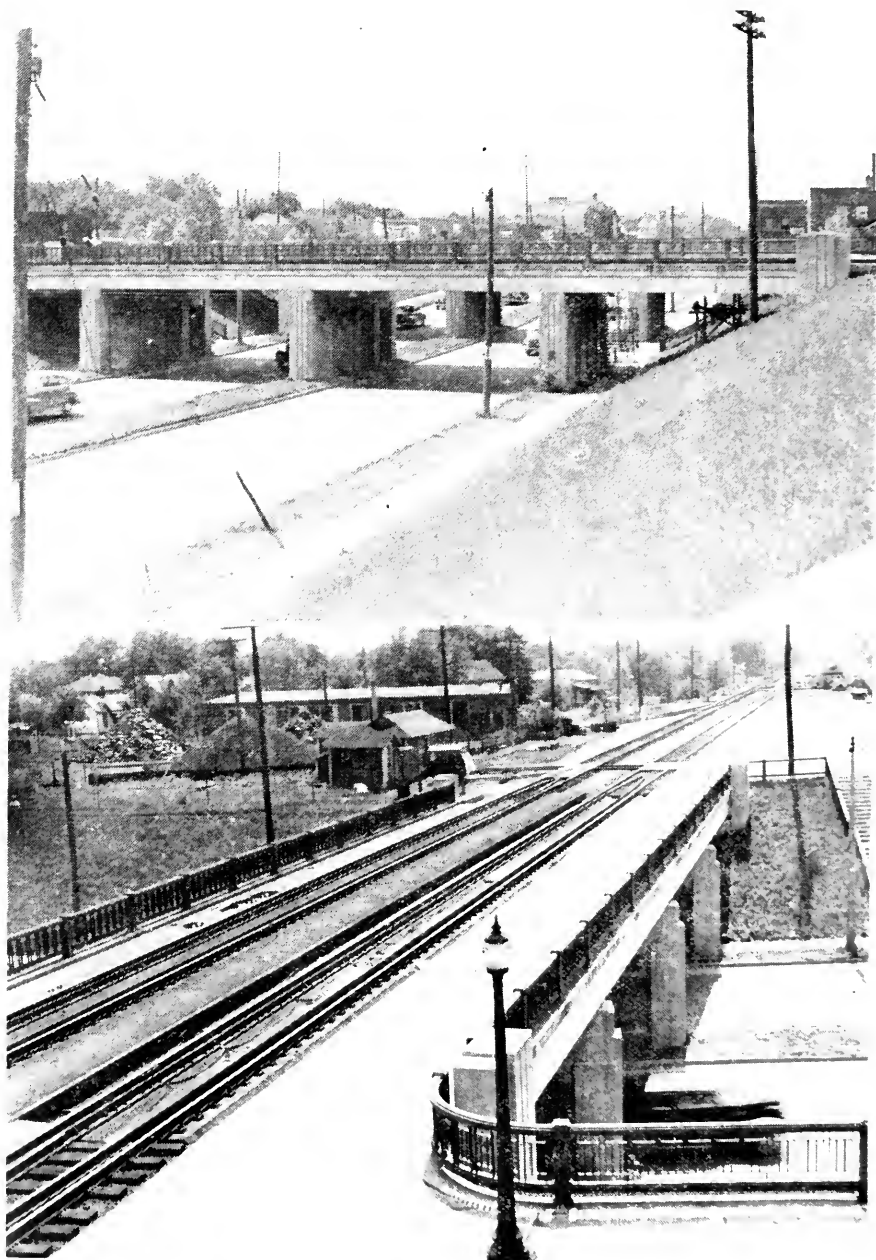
General views of reinforced concrete continuous span viaduct at Flint, Mich.
